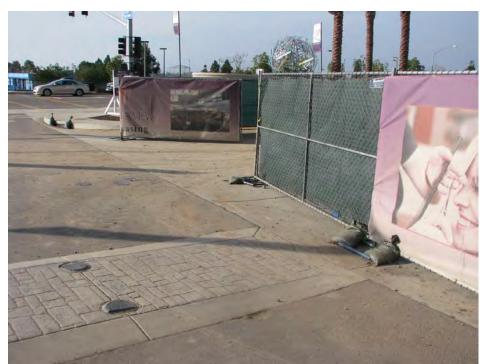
South-facing construction entrance; no BMPs; sediment tracking onto street
